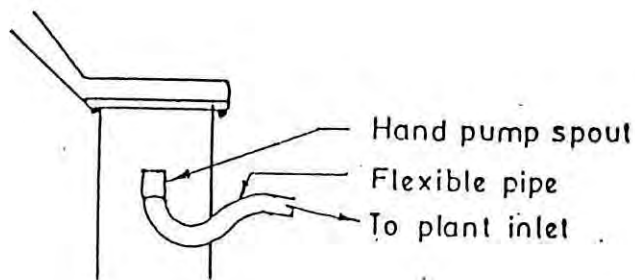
b T/WL SPOUT AND THE FLEXIBLE PIPE CONNECTION OF THE MODIFIED PLANT
